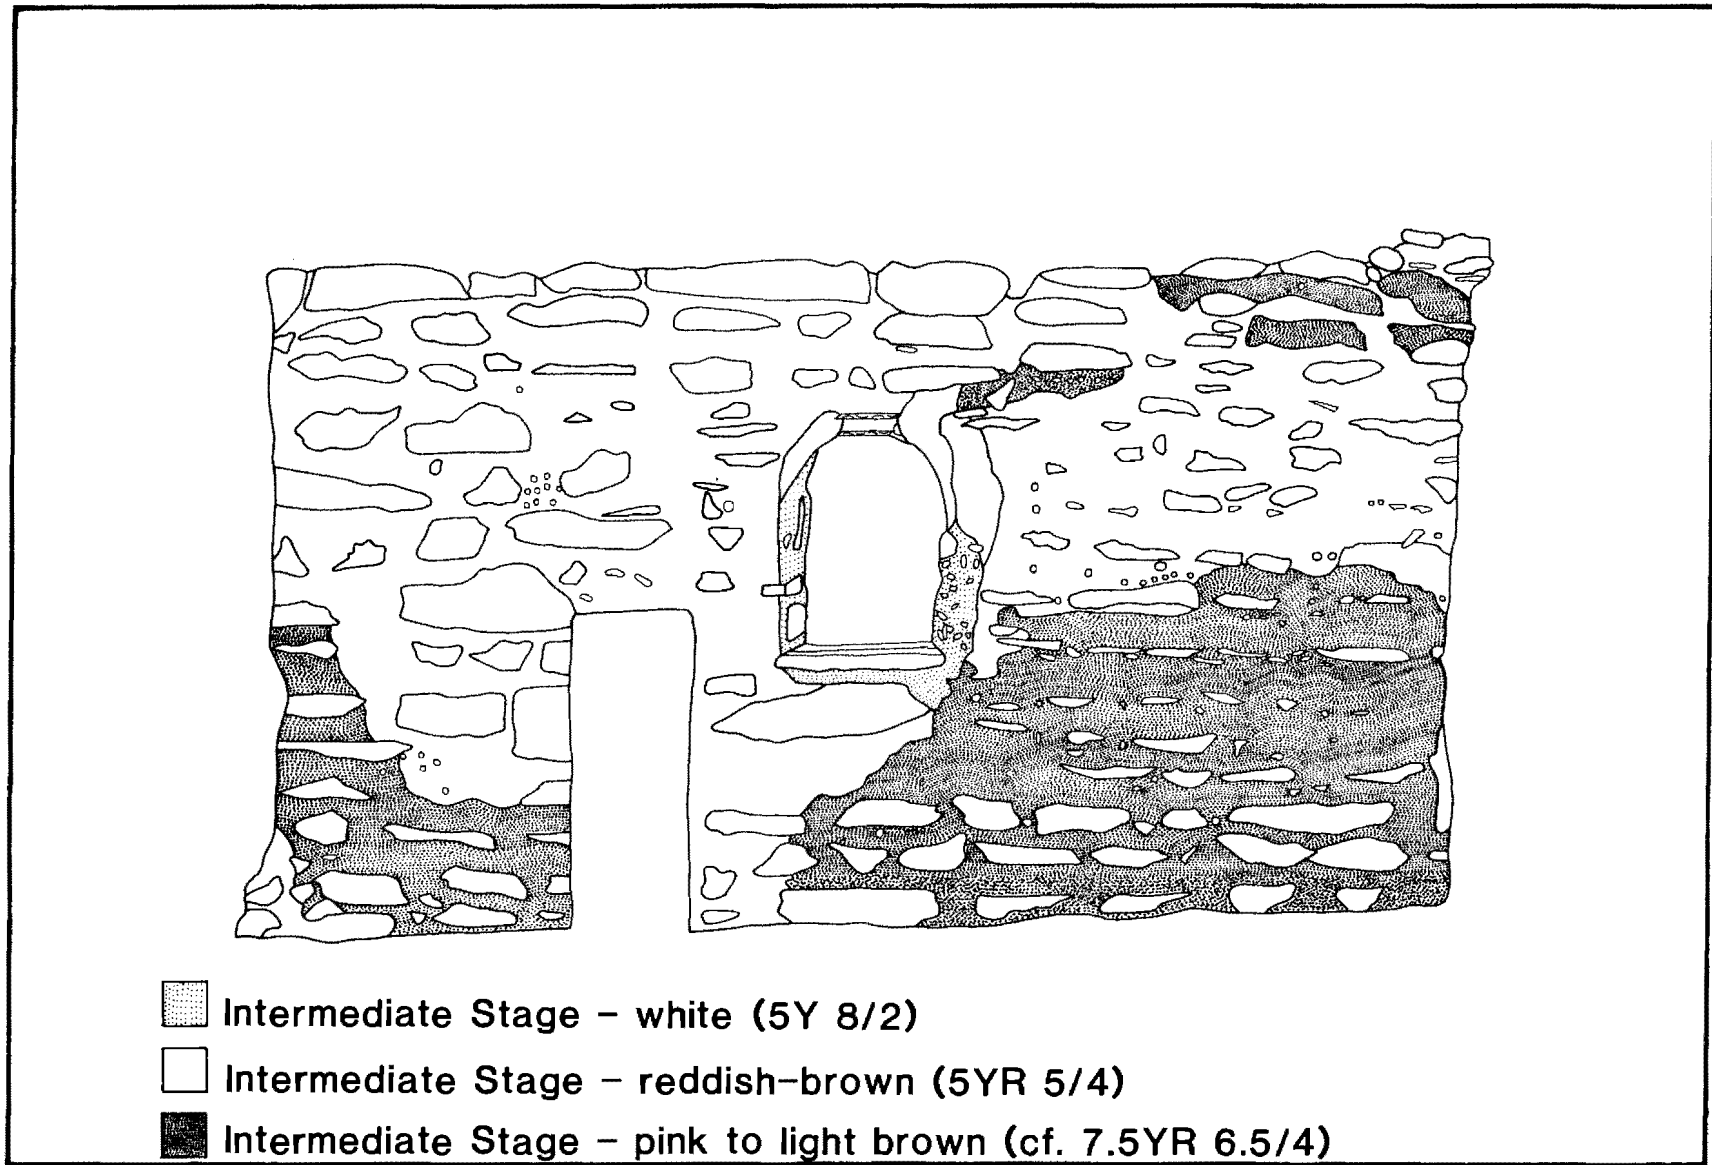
Sketch of Intermediate Stage Construction Showing the Front Wall of Room 7 in Room Block B
